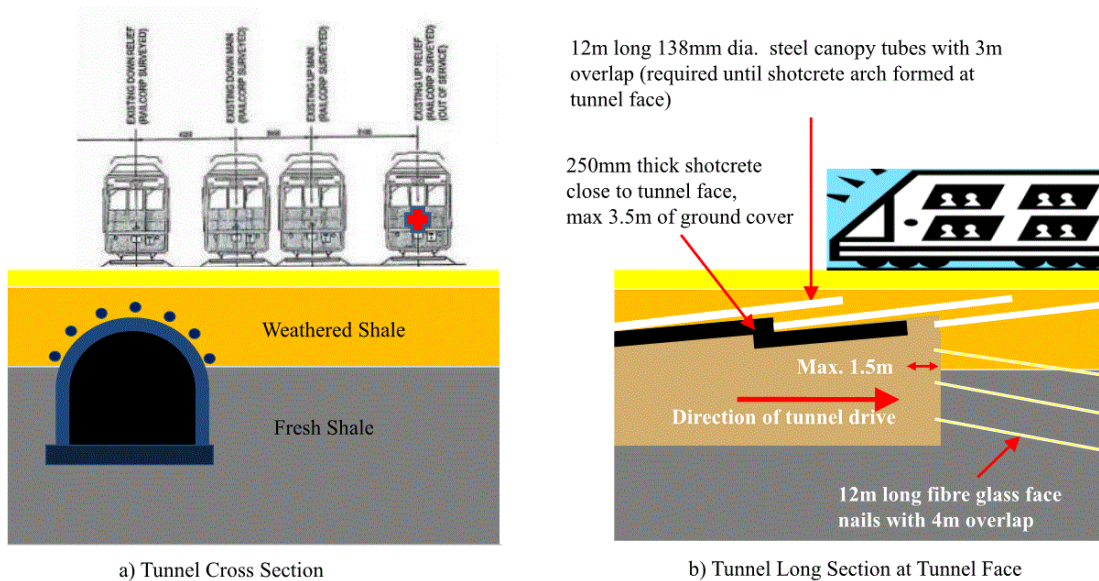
Schematic Cross section of tunnel and railway tracks, 3.5m maximum ground cover. Tunnel traverses the tracks on a skew.
